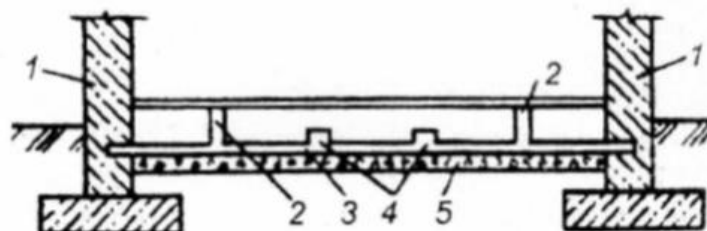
An example of strengthening a foundation by creating a new foundation slab; 1 - Existing foundation, 2 - Main beams, 3 - New slab, 4 - Secondary beams, 5 - Compact gravel
